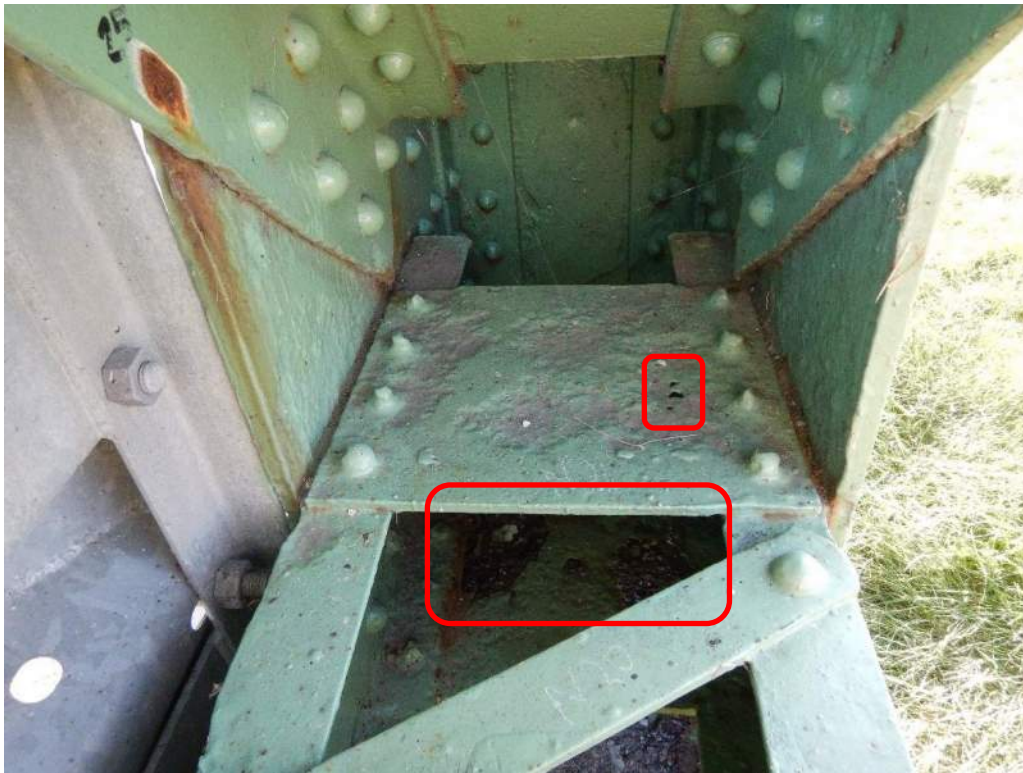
Perforations in upper and lower batten plates of tower truss horizontal member 18N-19N at node 19N. Note the very severe section loss of the batten plate rivet heads.
